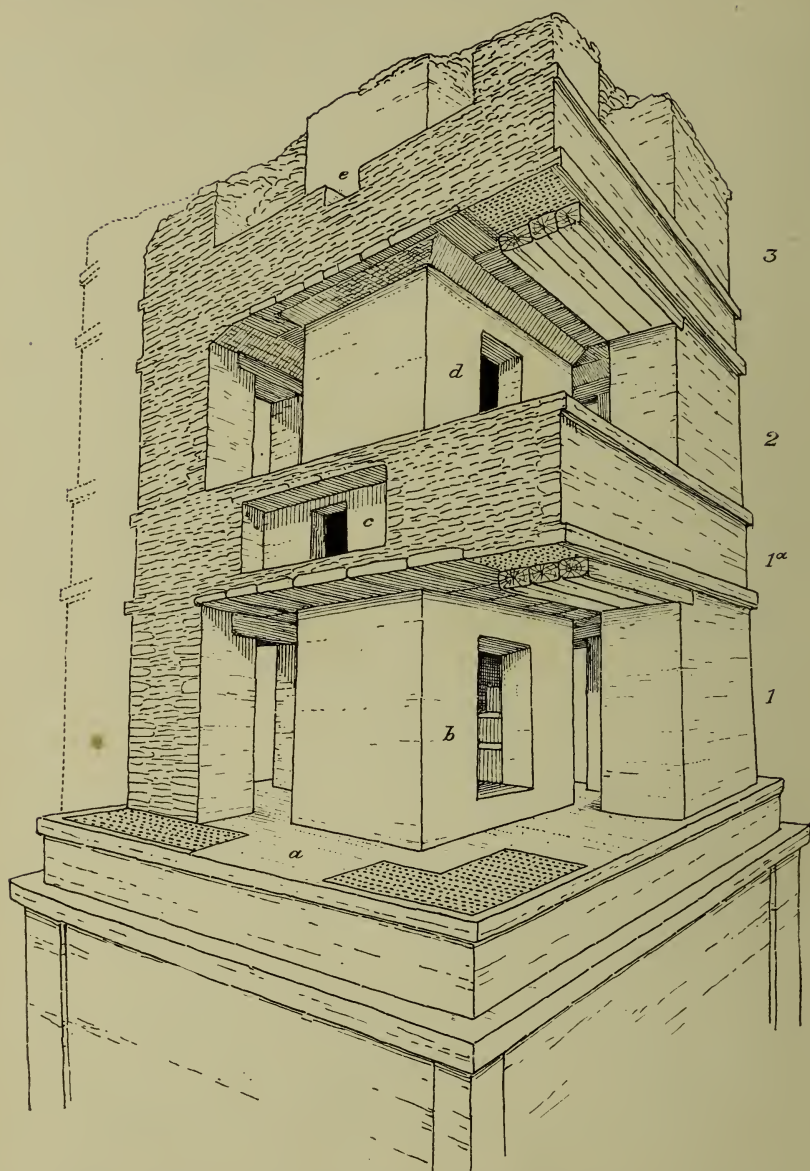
PARTIAL SECTION OF TOWER EXHIBITING VARIOUS FEATURES OF CONSTRUCTION.
